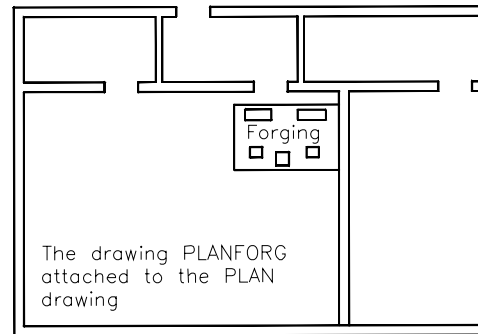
The PLAN drawing after attaching the PLANFORG drawing
